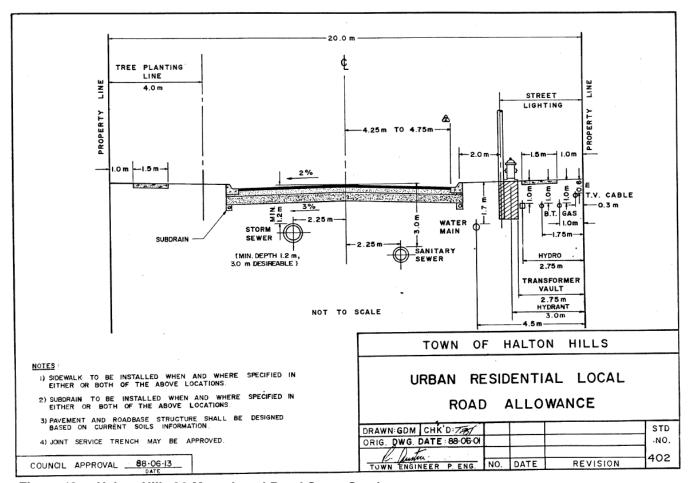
Halton Hills 20 Metre Local Road Cross Section
